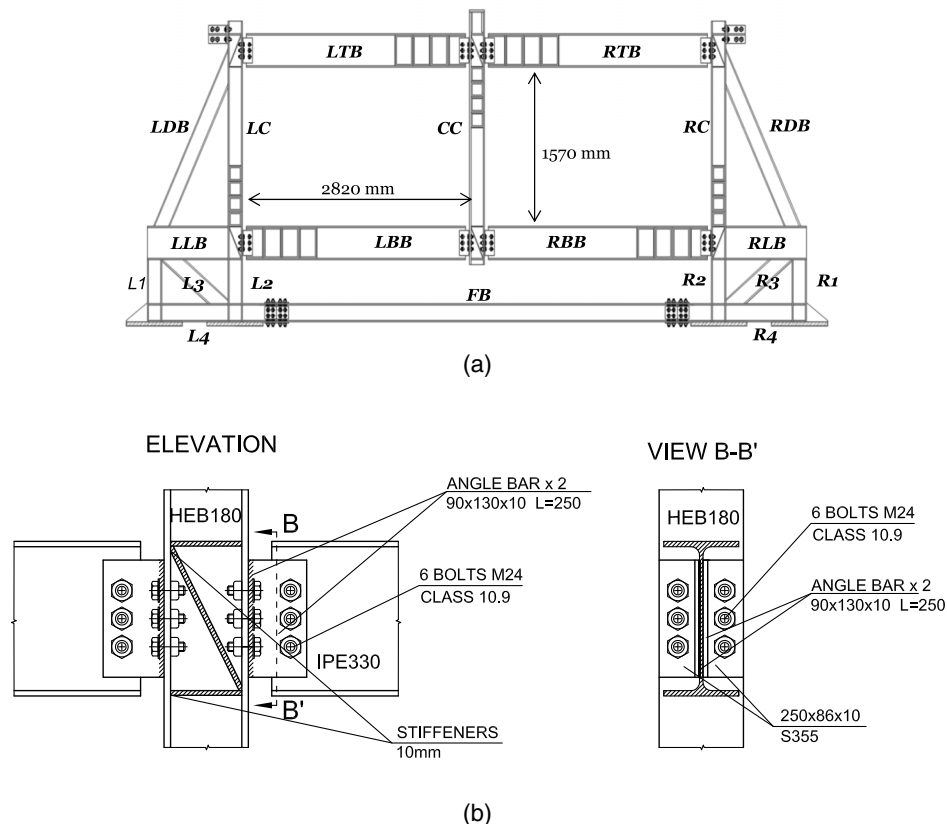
(a) Elevation view of the bare steel frame and the lateral bracings; (b) adopted partial-depth beam-column connection detail
